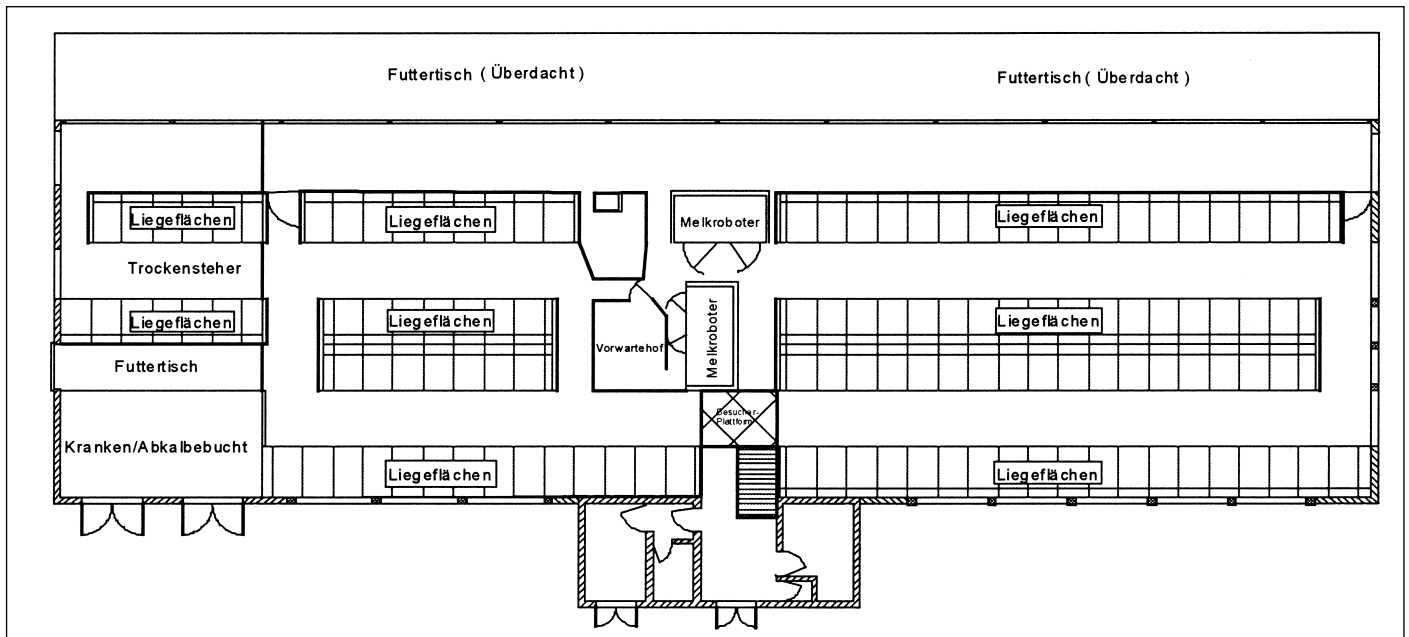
Ground plan of a front-open dairy cow house in Groß-Kreutz
